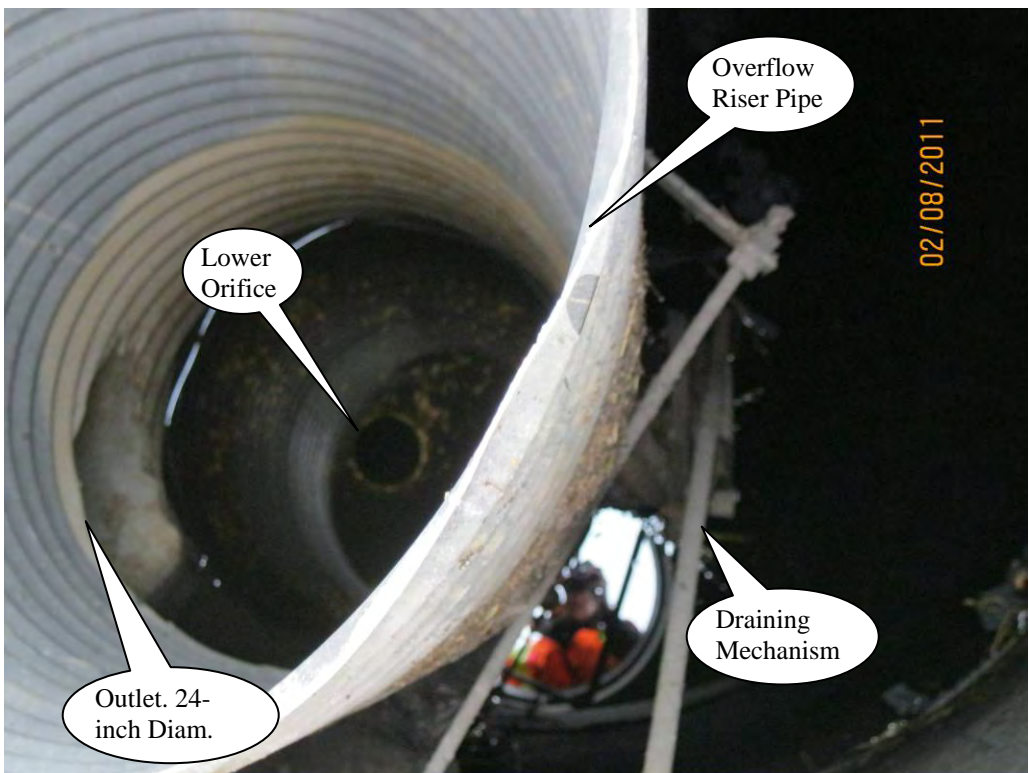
Interior view from Access N to flow control manhole. Top of overflow riser pipe, lower orifice, outlet from manhole, draining mechanism (Point E on Operational Plan in Appendix A)
